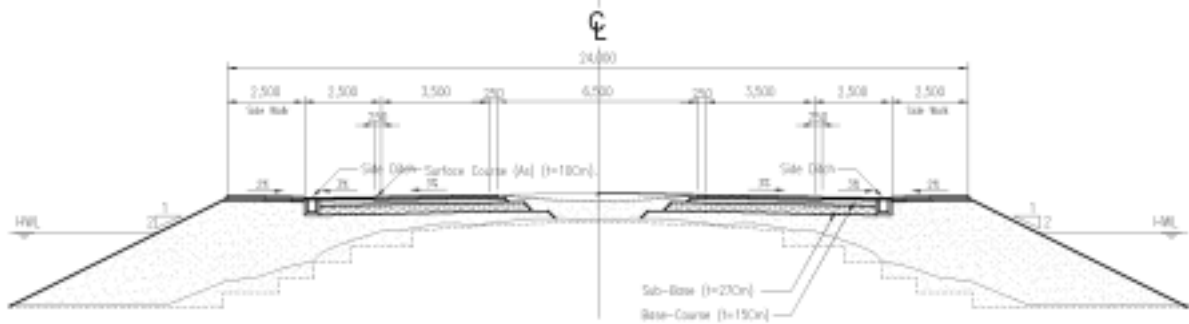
shows some of the typical cross section adopted in the design of improvement. (All the typical cross sections are shown in the “Drawings”.) As explained in Chapter 12, full 4-lane section is proposed urbanized sections near Chbar Ampov Market (300 meters) and Kokir Market. Between Cbbar Ampov and Kokir Market is proposed to be provided with embankment with the width for future widening for 4-lane and pavement width for divided 2-lane with paved shoulder for slow-going vehicles. From Kokir Market to End Point is proposed to be opposed 2-lane with paved shoulder for slow-going vehicles.
